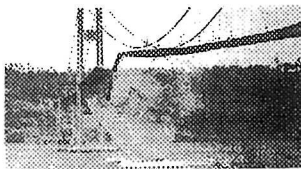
Tacoma Narrows Bridge collapse (1940)
